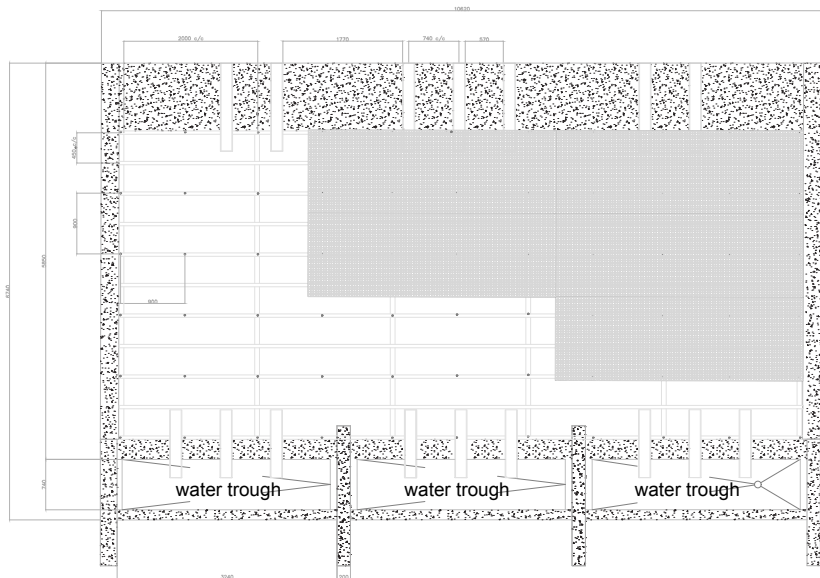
Detail 3.2-Plan showing fixing detail of fibre grating and spacing of PFC - not to scale (Author: 2013)
